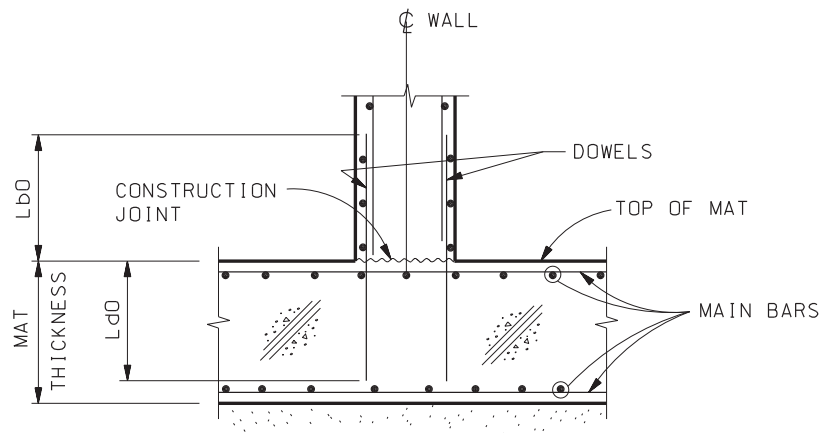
A-38 Typical Reinforcement of the AB Basemat (Section B)
